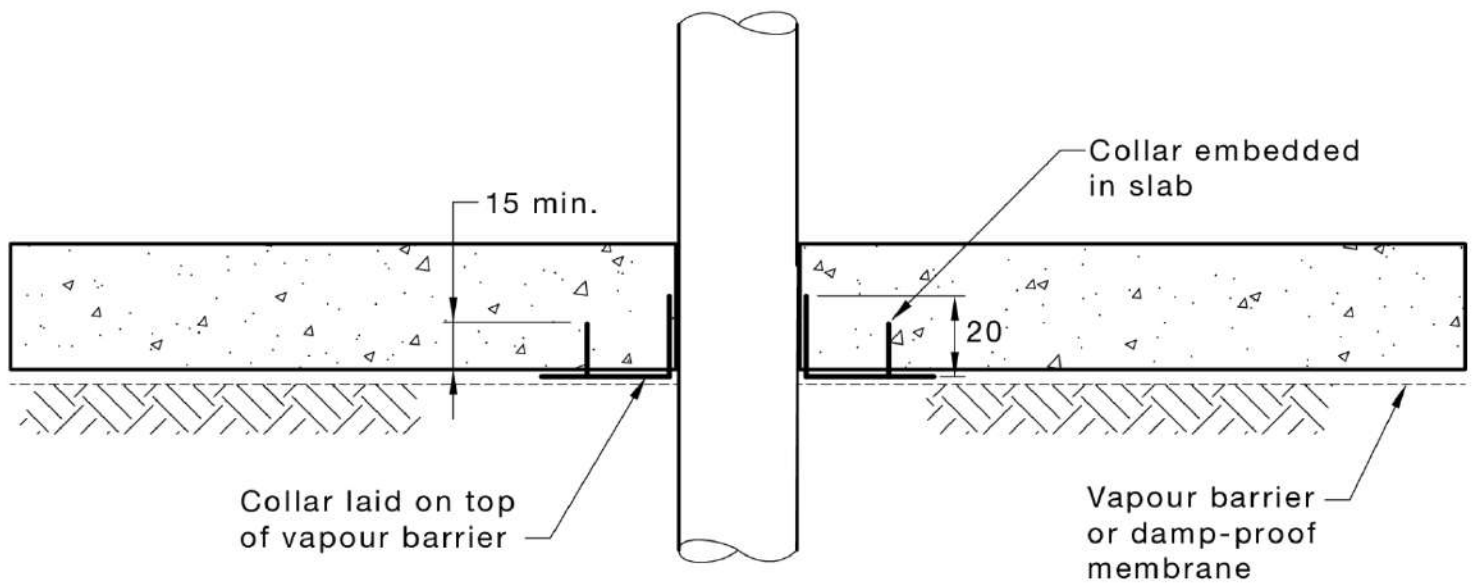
Typical details for the installation of sheet at service pipe penetrations
